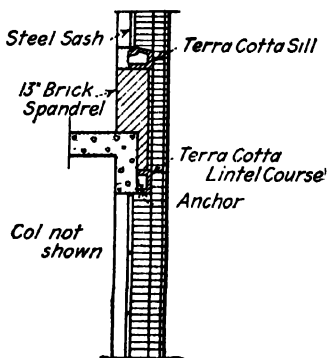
Brick spandrel wall and pier—terra cotta lintel course supported on spandrel angle.
